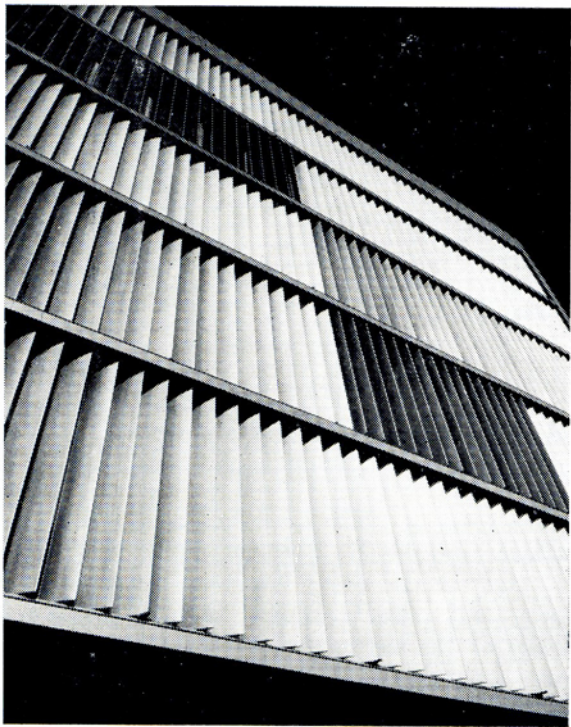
Movable Exterior Aluminium Sun Protection Devices at West Facade of Office Building, Sussex Street, Sydney.
